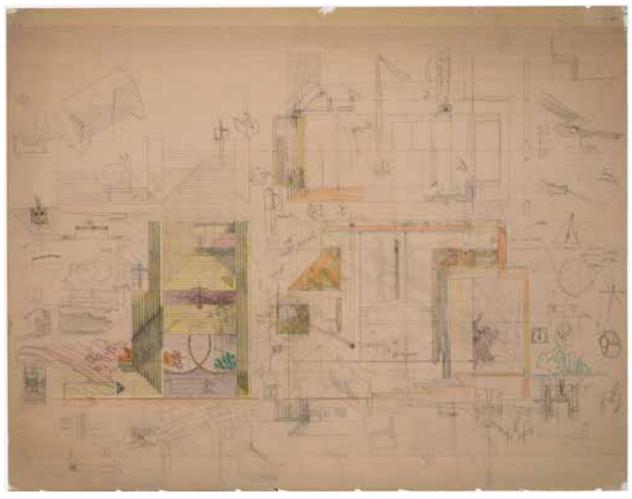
Brion Cemetery, San Vito d'Altivole, plan, section and elevation, Carlo Scarpa, 1969.
